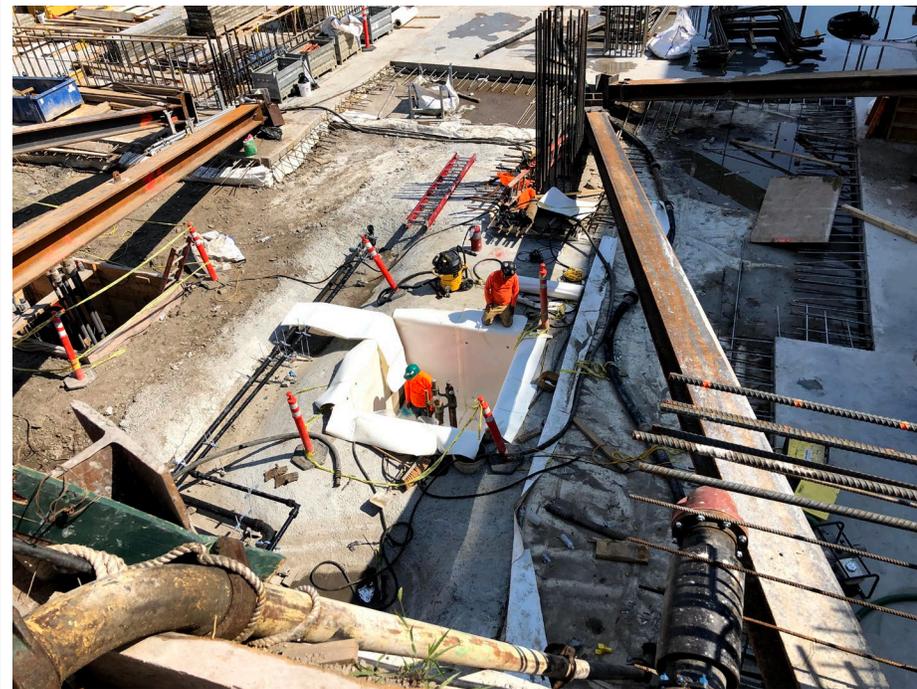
Looking southeast, New Leaf pumping concrete into mat slab in the east portion of the Site.
